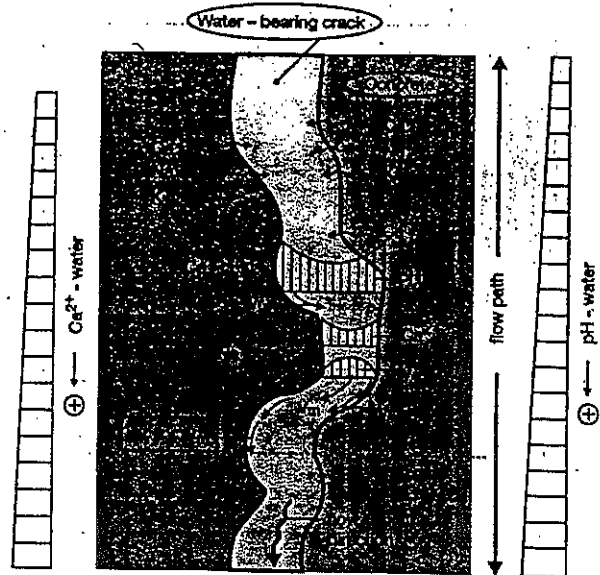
Conditions in water-penetrated concrete crack.<sup>5</sup>
